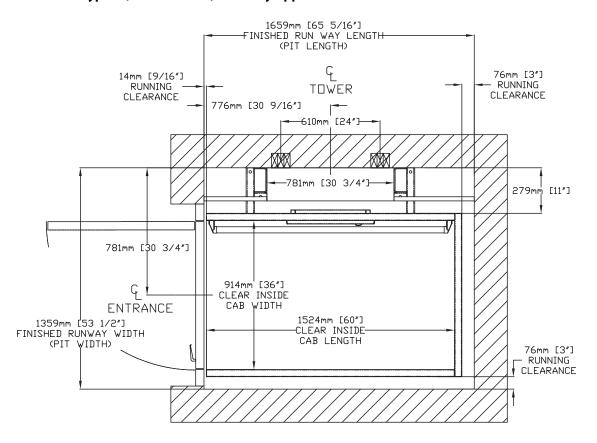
Plan View - Type 1L, 36" x 60" Cab, Enclosure Application
